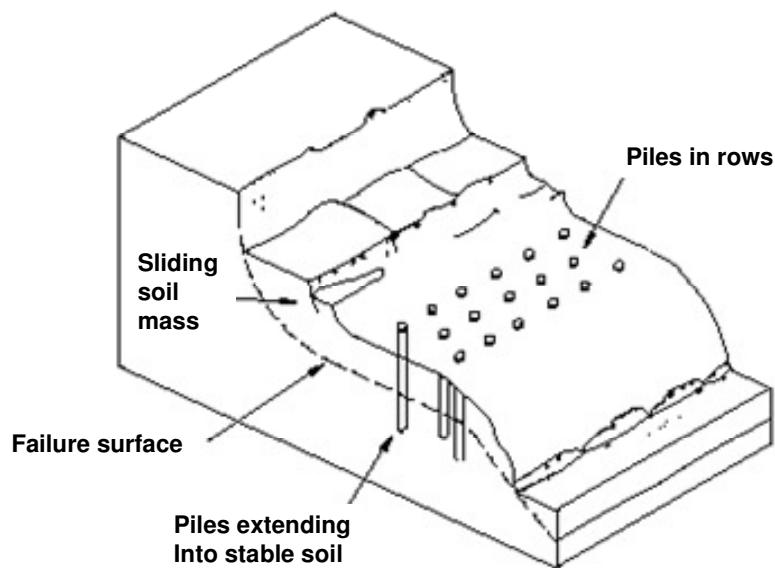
Pile rows for slope stabilization (after White, *et al.* 2005)
